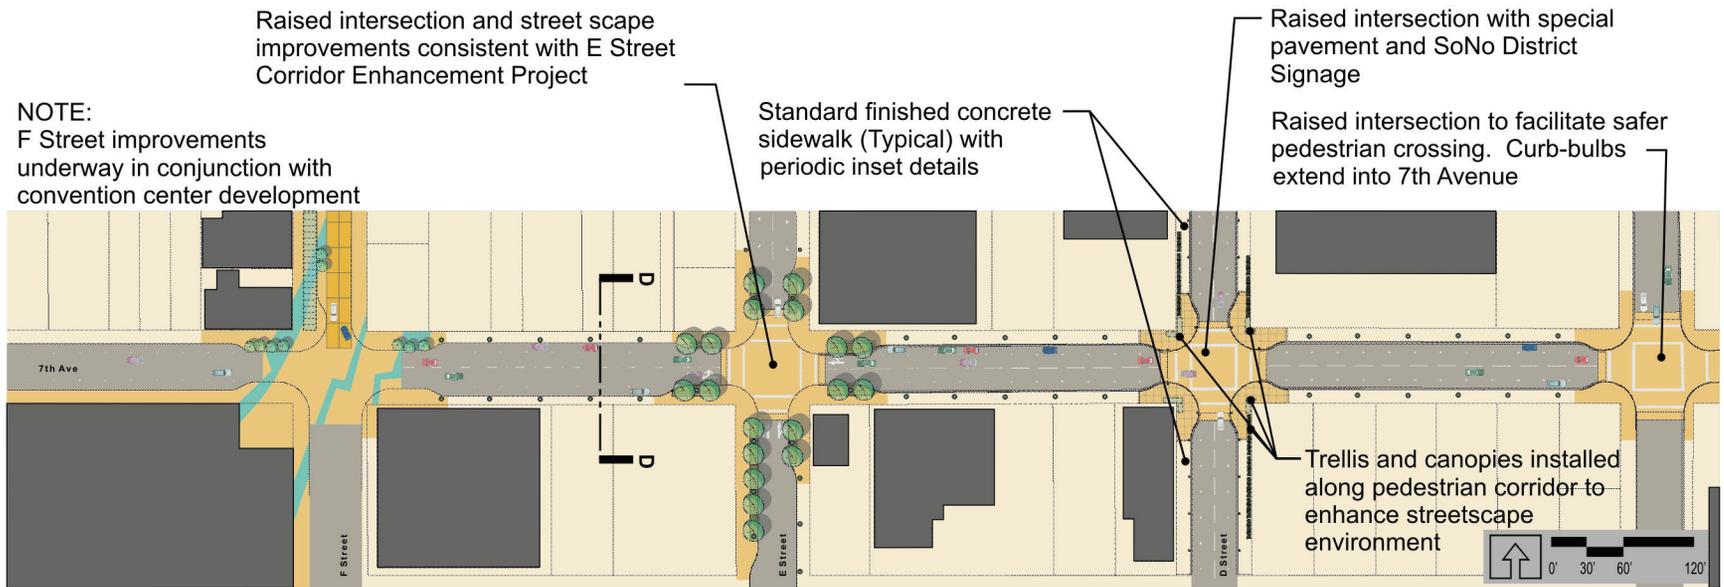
Proposed 7<sup>th</sup> Avenue Layout
